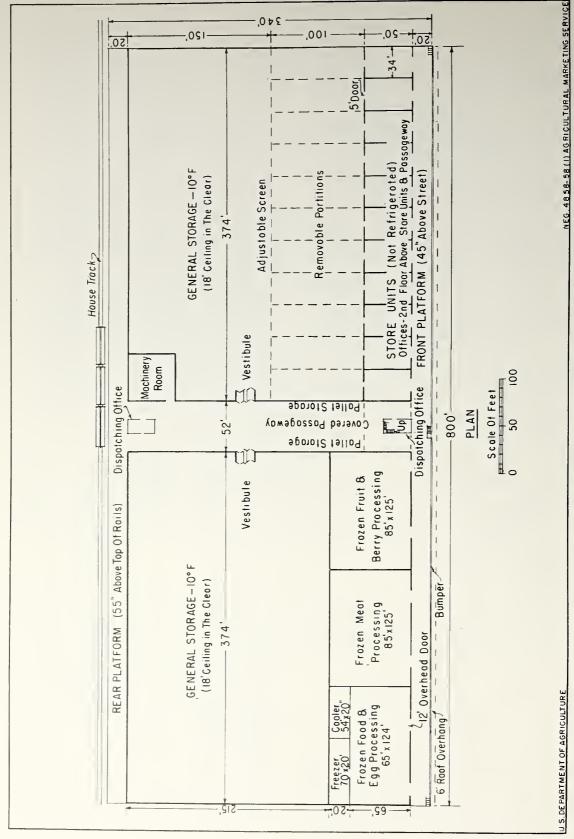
Suggested plan for frozen food and public refrigerated warehouse. (All dimensions are for outside of building.)
